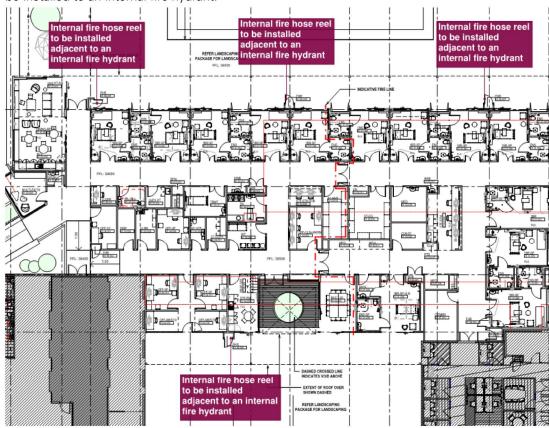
Internal fire hose reels located more than 4 m from an exit to be installed adjacent to an internal fire hydrant
